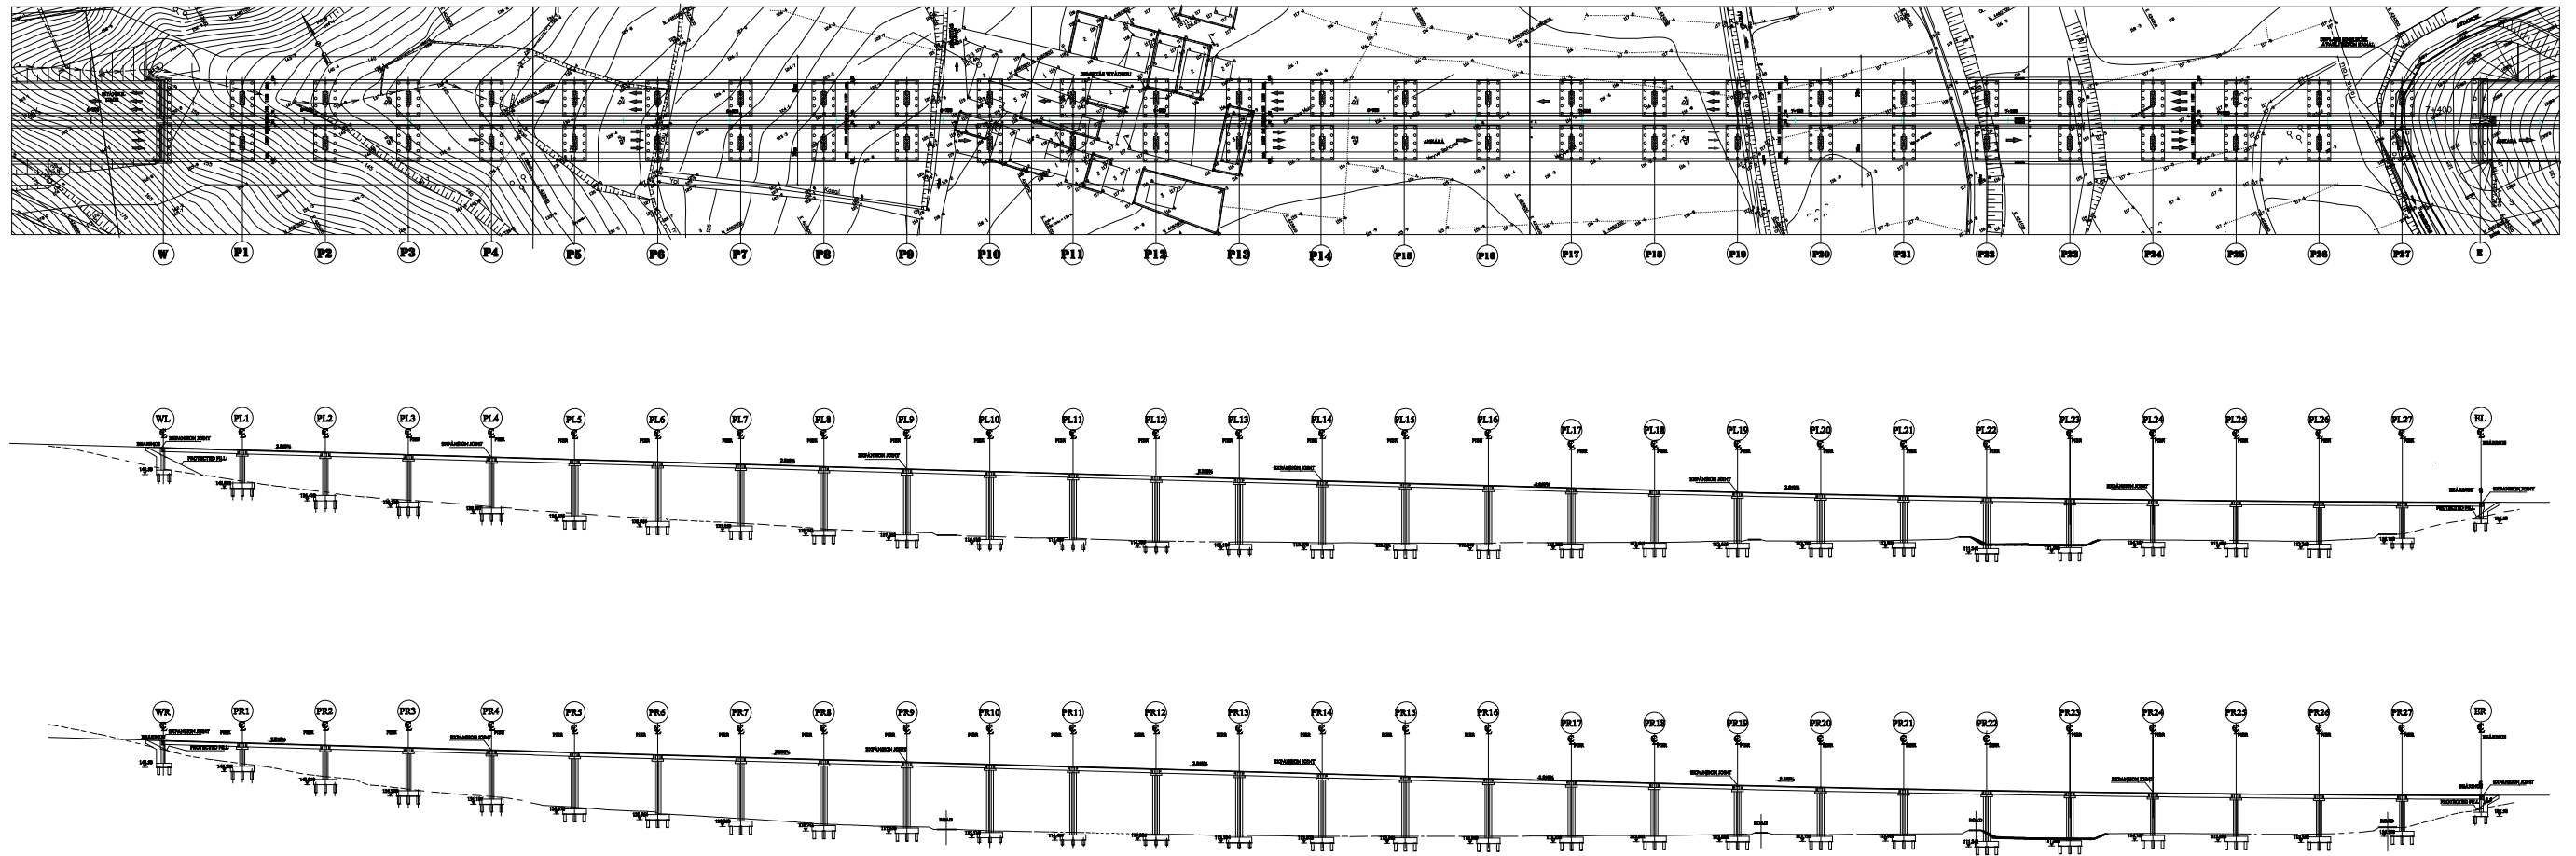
Plan and Elevation View of Demirtas Viaduct
